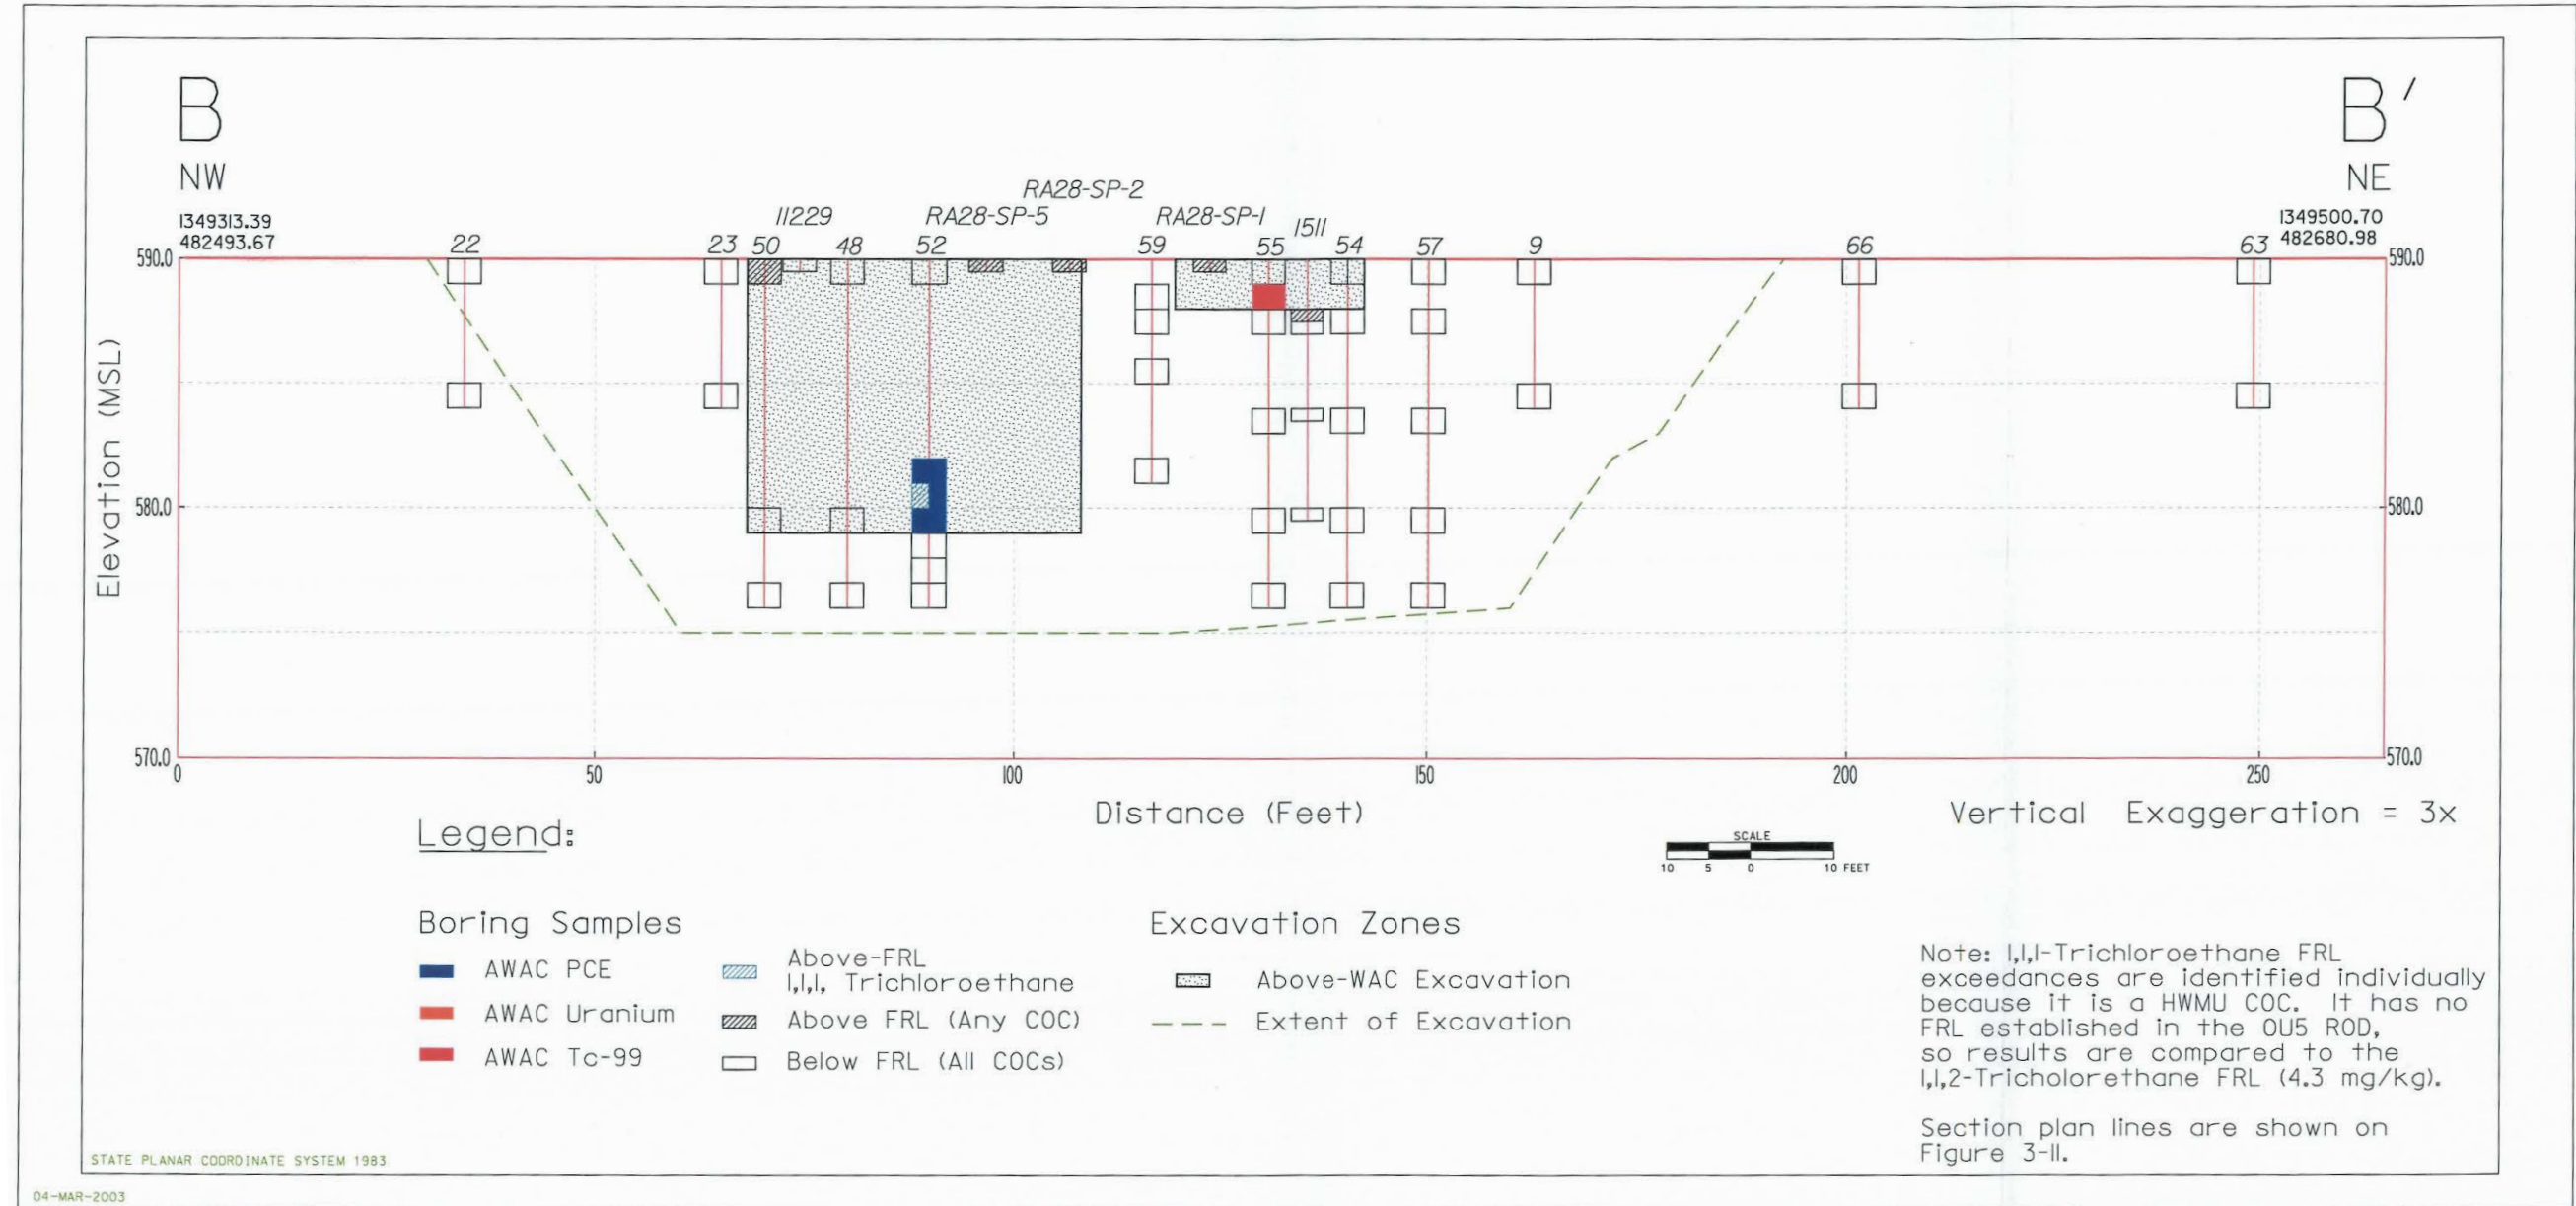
CROSS-SECTION "B" OF THE ABOVE-WAC EXCAVATION ZONE IN THE FIVE TRAINING PLOTS
